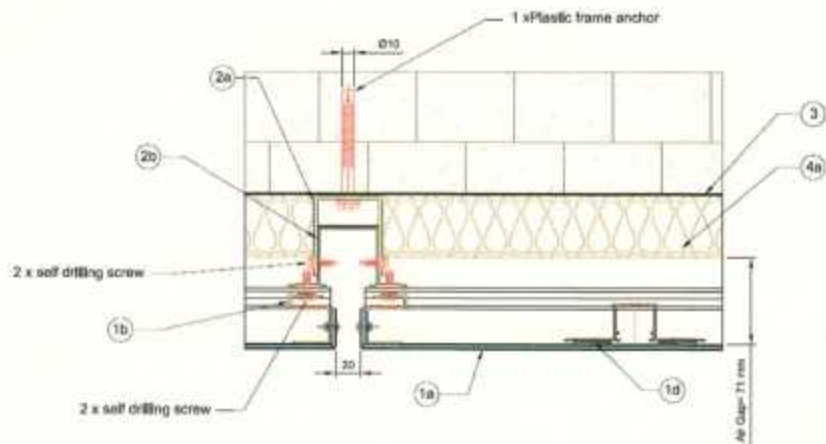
"Alucopanel" U.S.A. FR-A2 non-load-bearing exterior wall cladding assembly horizontal section details
